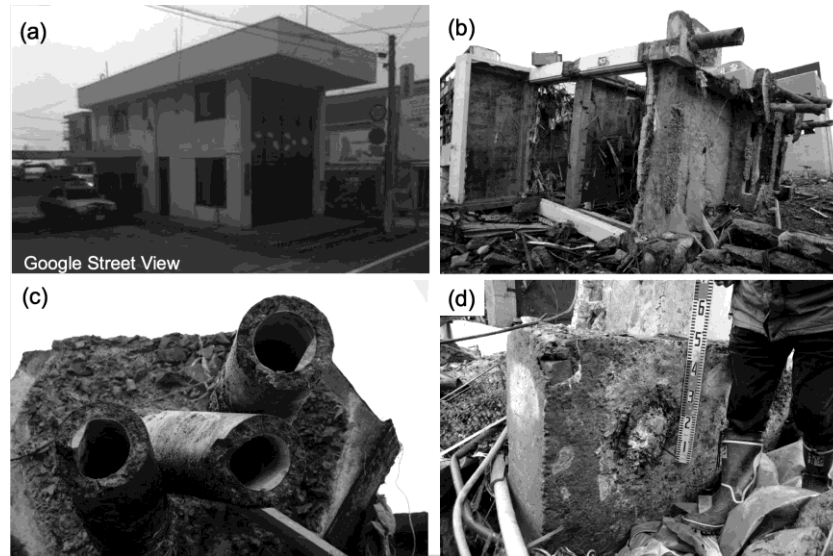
shows Building D, a three-story RC building with spread foundation that toppled, split into two or three sections, and drifted landward during the first tsunami runup. While the left section seen in Figure 5(a) was found about 175 m landward from its original position (Figure 2), the right section only about 75 m landward near Building E (Figures 2 and 5(b)).
